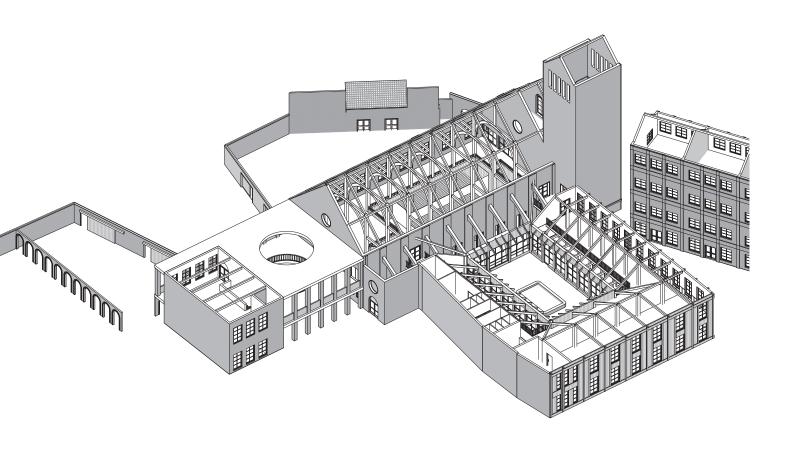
Structural axonometry trusses, flying butresses, masonry and timber frame construction
